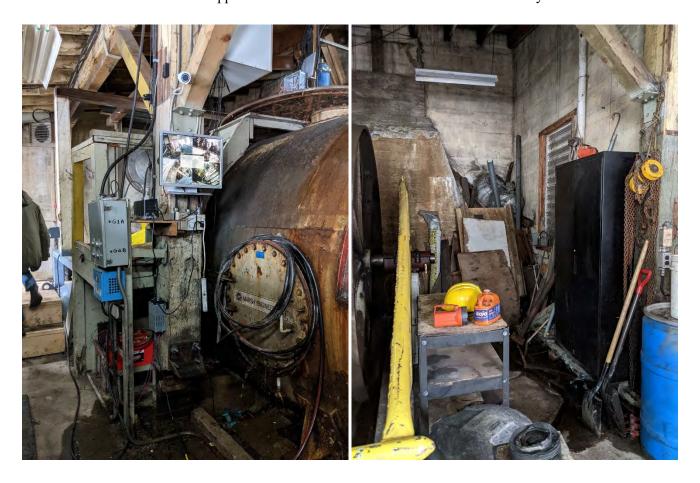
Station Cleanliness and Concrete Degradation/Oil Saturation
